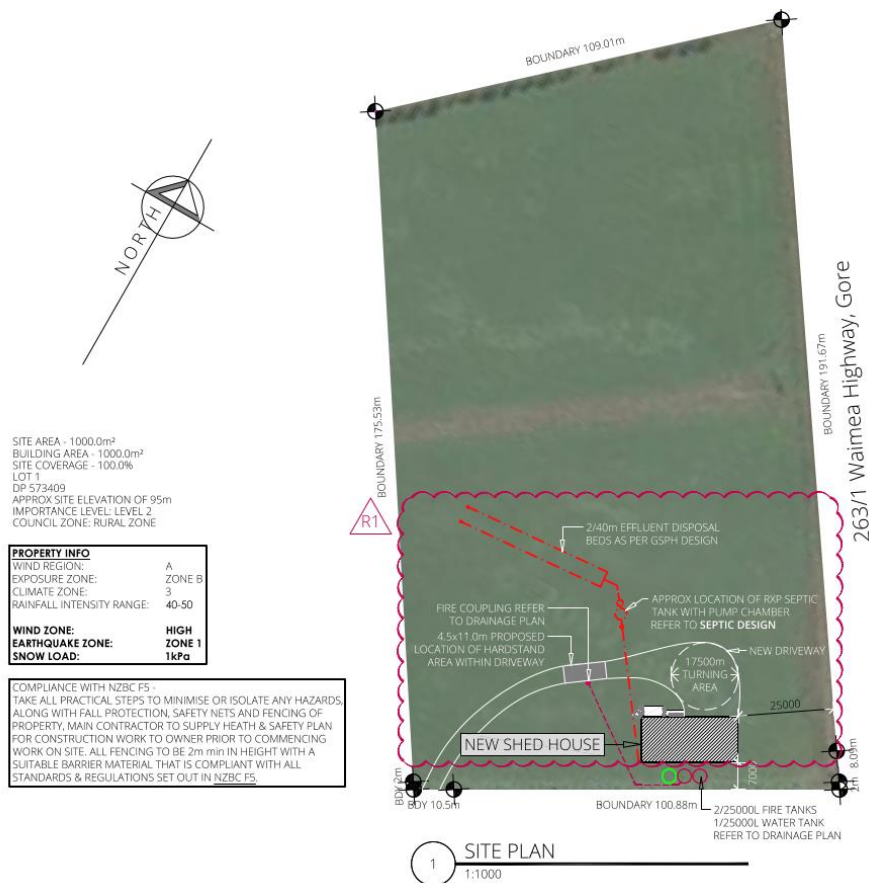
Proposed site plan illustrating the shed containing the residential unit being located 25m from the state highway.
